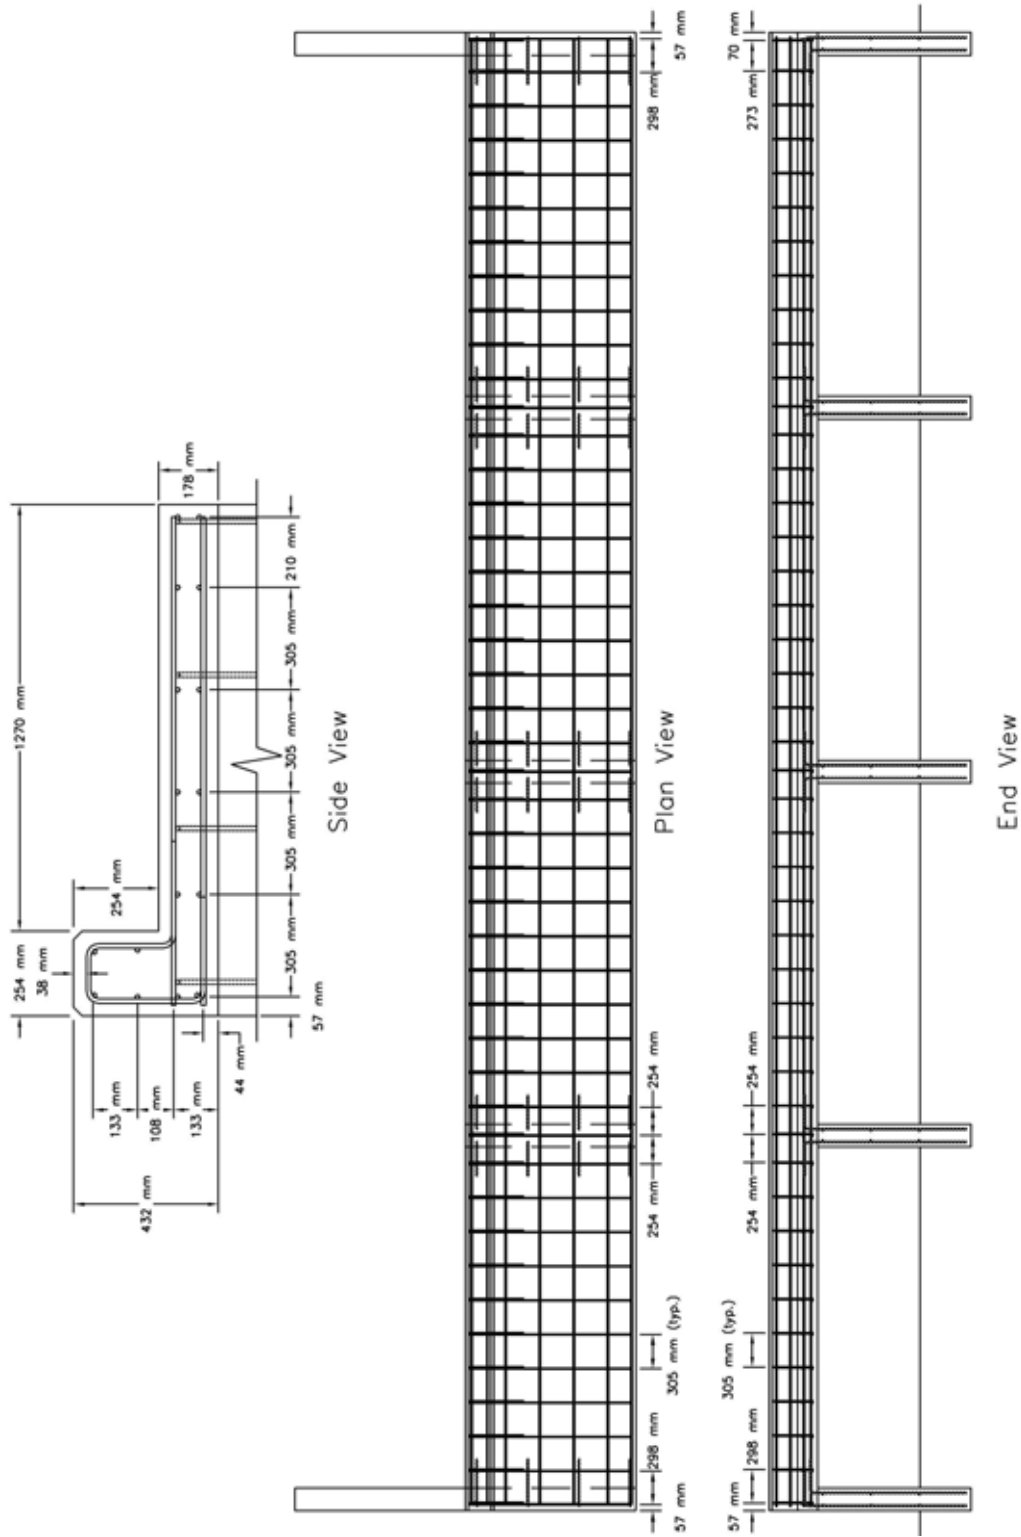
Concrete Culvert Top Slab and Curb Details – Plan, End, and Side Views
